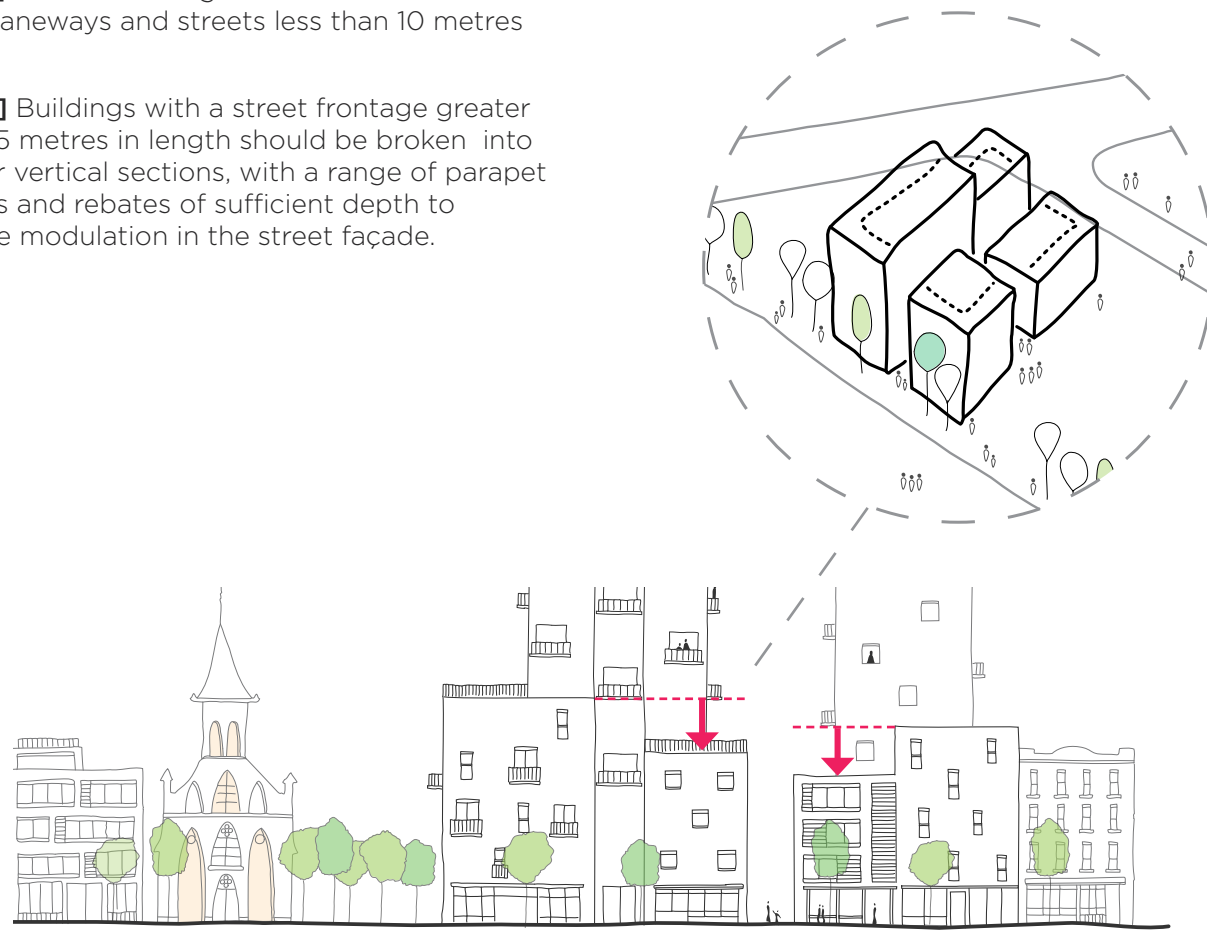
The building mass is broken down into smaller parts to minimise the impact of a large building on the public realm, and contribute a human scaled building mass. A lower street wall is adopted along the laneway interface where the width of the laneway is less than 10m.
